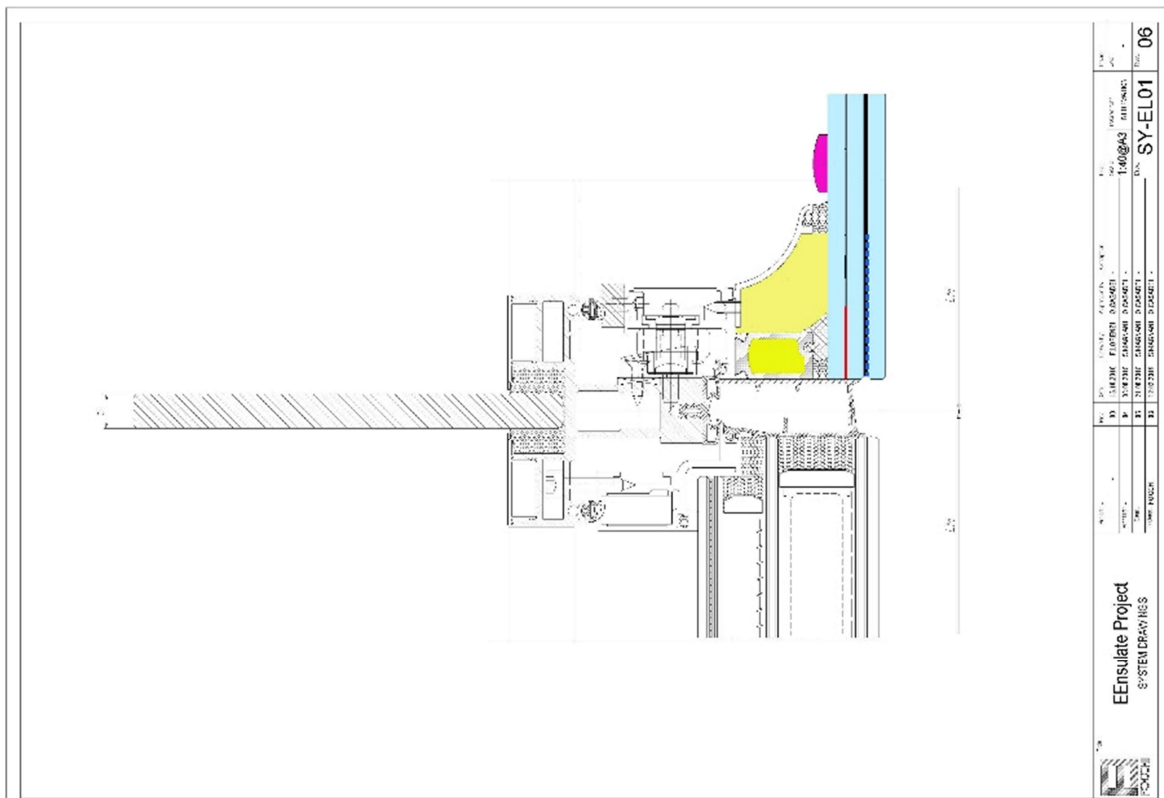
Horizontal section between unit elevation with structural silicon and existing unit - Demo 4
